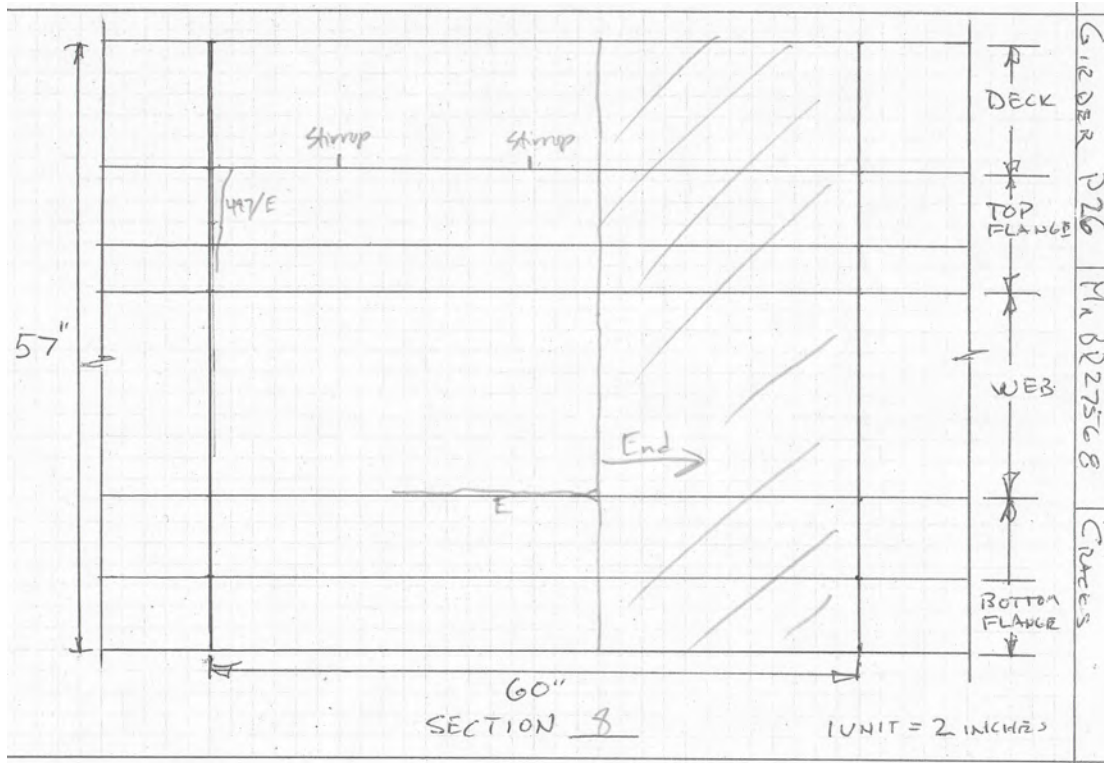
Girder P26 crack pattern – Section 8
